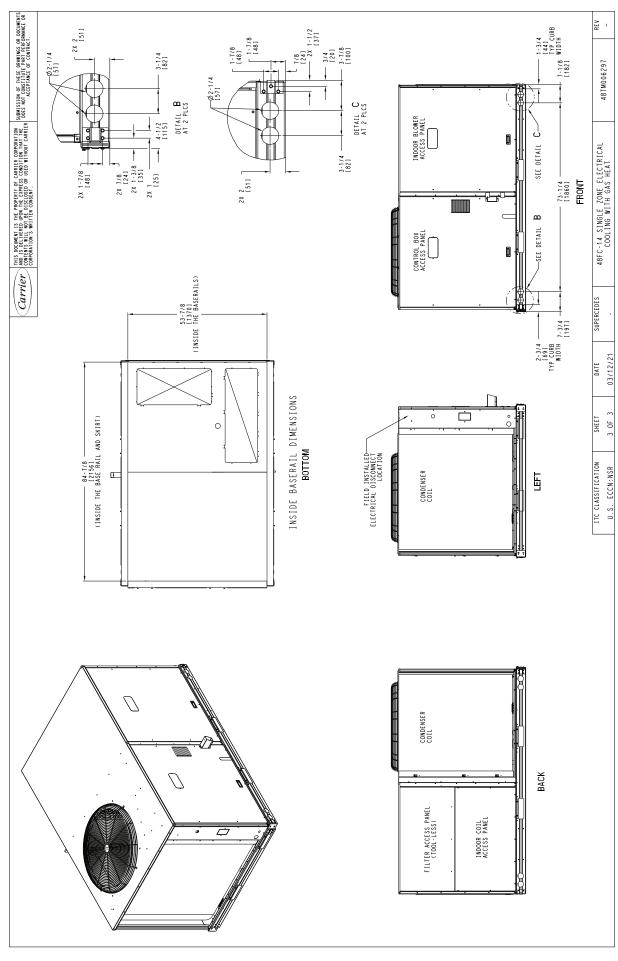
Unit Dimensional Drawing – Sizes 14 (cont)
